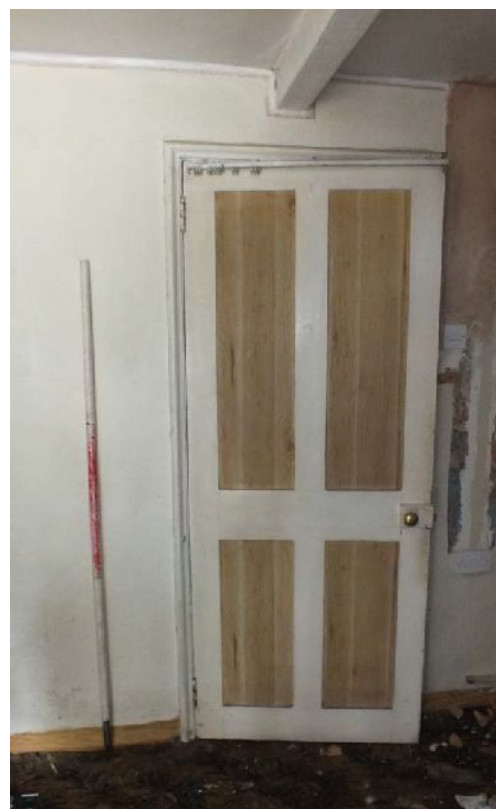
(right): Door in the north-east elevation, Room G6, viewed from the south-west
